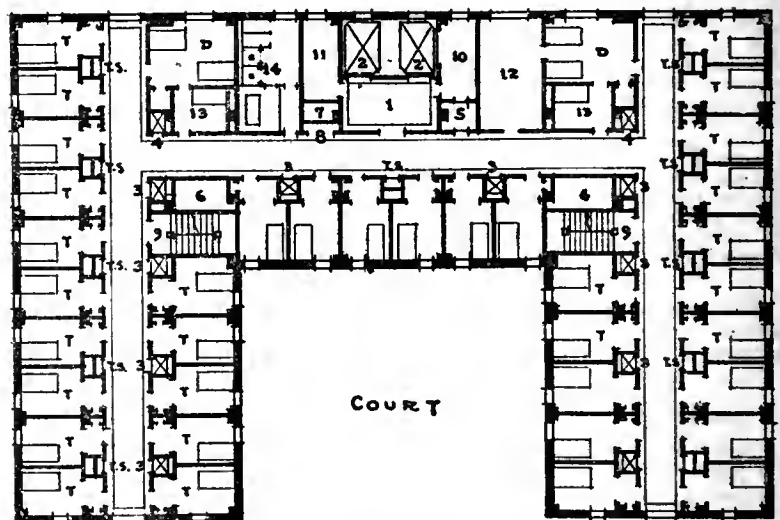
Typical floor plan of 160 bed hospital: 1, elevator lobby; 2, elevators; 3, service dumbwaiters; 4, specimen dumbwaiters; 5, linen and waste paper chute; 6, vent ducts; 7, pipe shaft; 8, medicine cabinet; 9, stairways; 10, service and janitor room; 11, toilet room; 12, dressing room; 13, bath and toilet rooms; 14, shower and tub room; 15, floor drain; 16, three-leaf door; 17, lockers; 18, dumbwaiters; 19, door to dumbwaiter; 20, pipe space; 21, entrance to rooms; 22, center line of corridor; 23, windows; 24, steel cabinet for equipment; 25, exterior wall; 26, electric light and attachment; 27, sliding screen; 28, staple ringer hooks; 29, shelf for equipment work; 30, swivel spout for bedpan and washing and shower attachment. According to this plan a five story building would have a capacity of 120 beds, a six story building 160, and a seven story building 200 beds.
